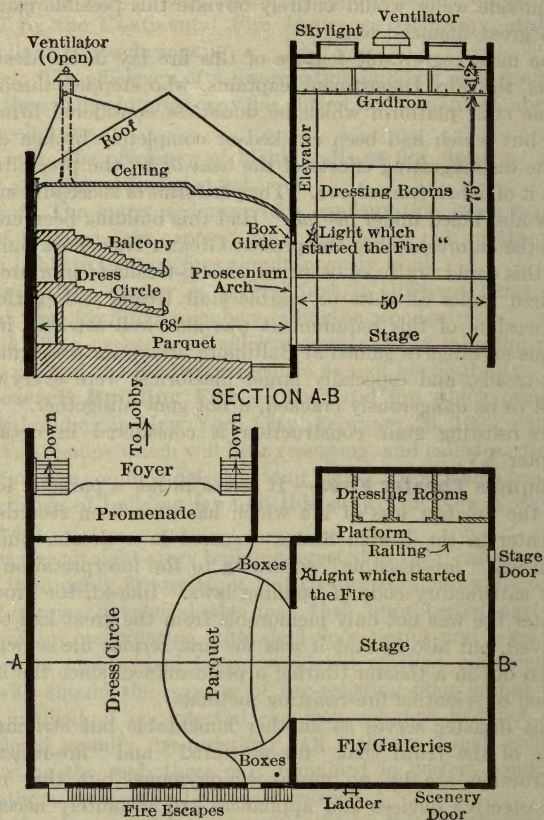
Cross Section and Plan of Iroquois Theater, Chicago.
